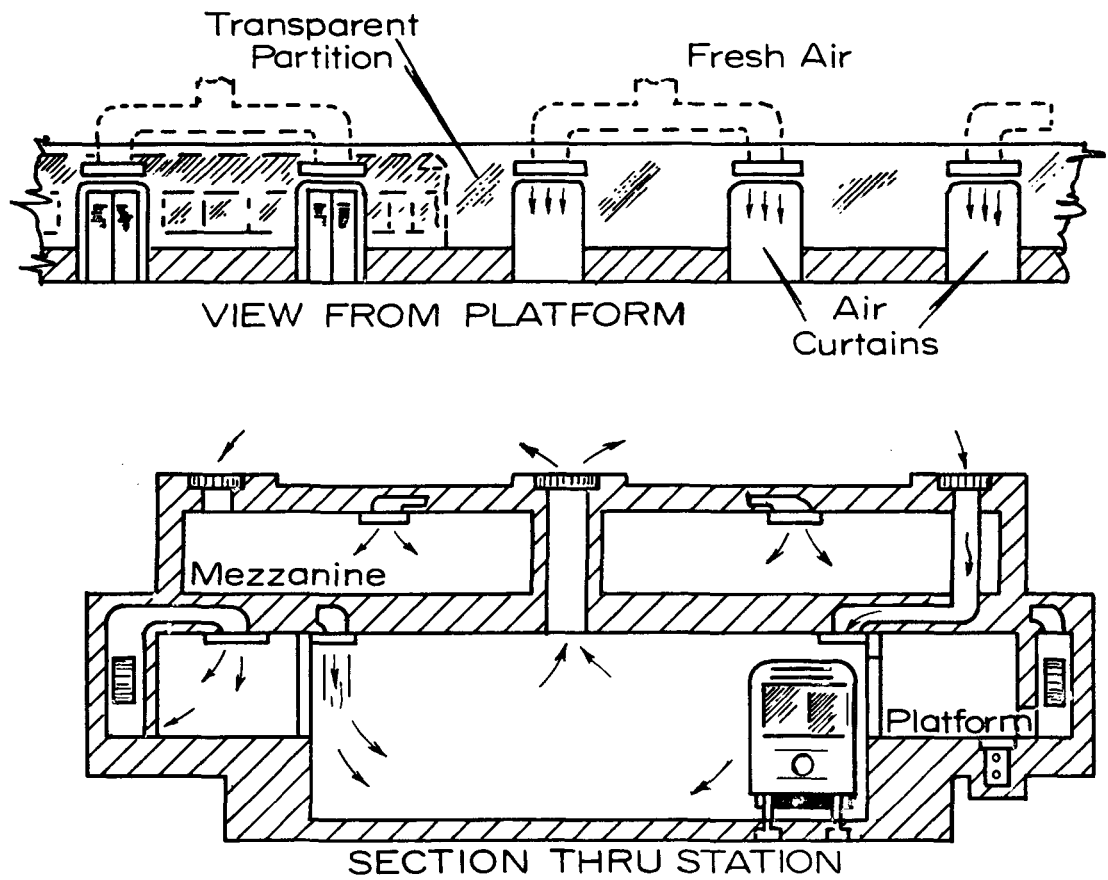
Station Air Conditioning and Ventilation Layout, (1).
